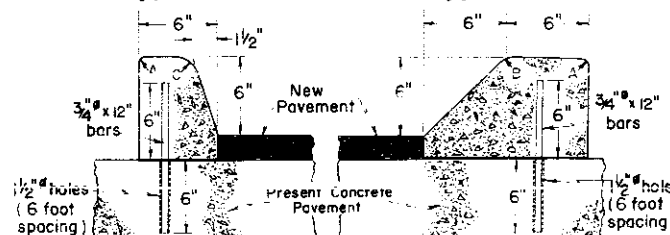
## DETAILS OF CONCRETE COMBINATION CURB & GUTTER (VARIABLE) AND CONCRETE CURB (VARIABLE)
